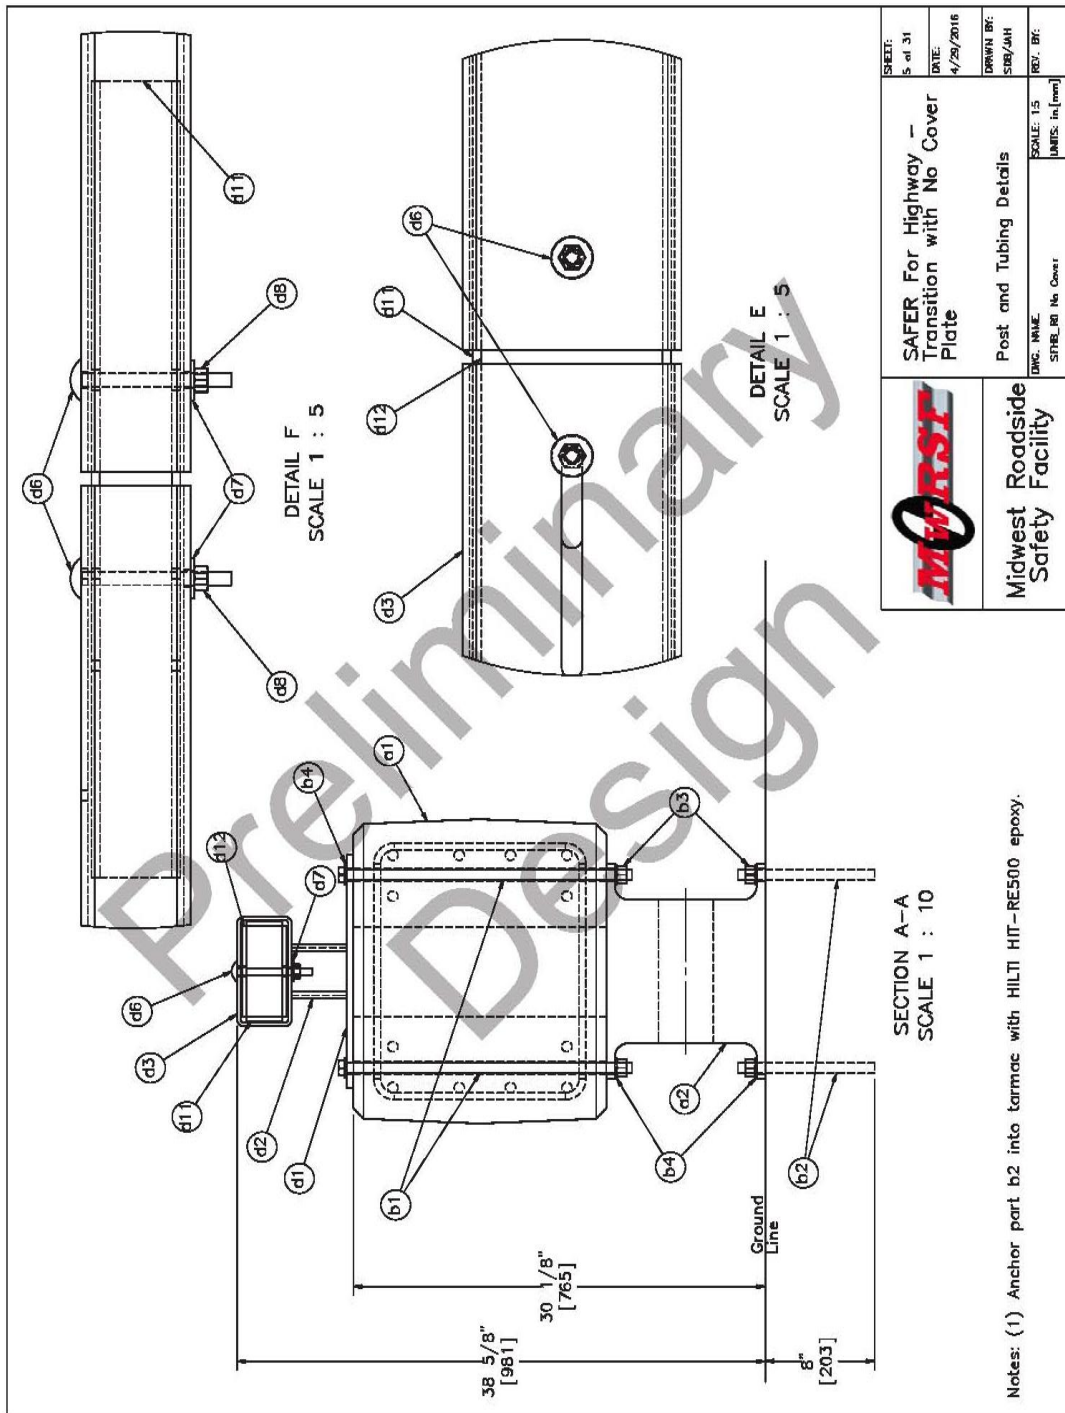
Post and Tubing Details, No Cover Plate, RESTORE Barrier Transition
